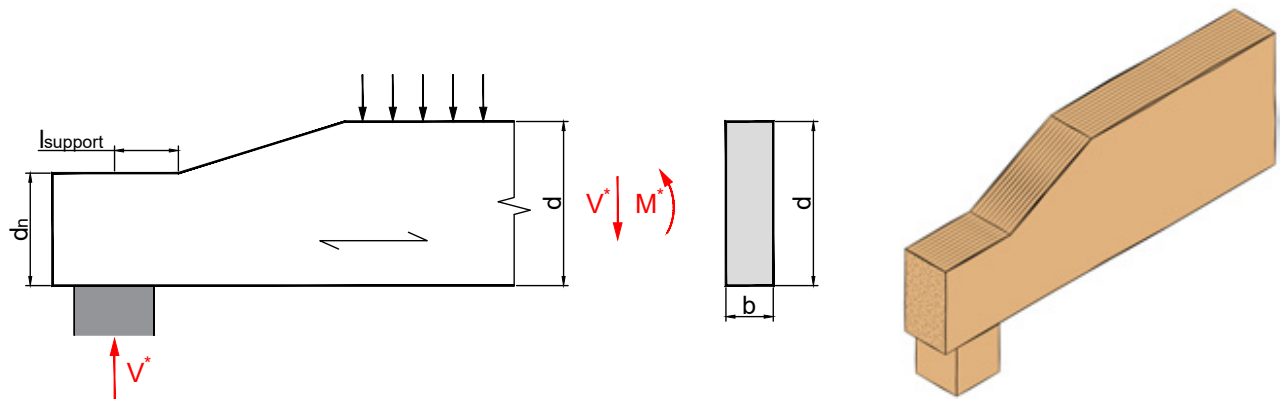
Notched beam cut on the upper edge opposite that from the support.
